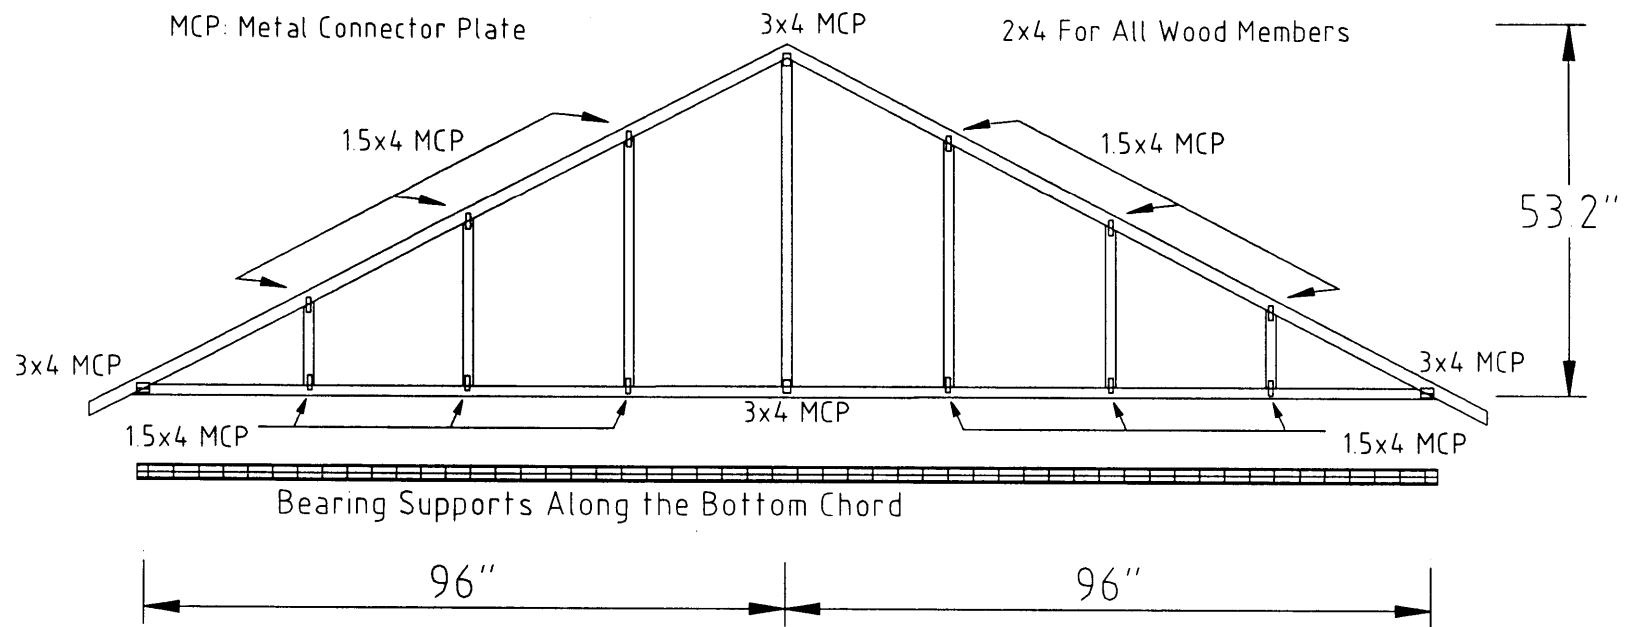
MPC Truss Type BGB from a Truss Plate Manufacturer
